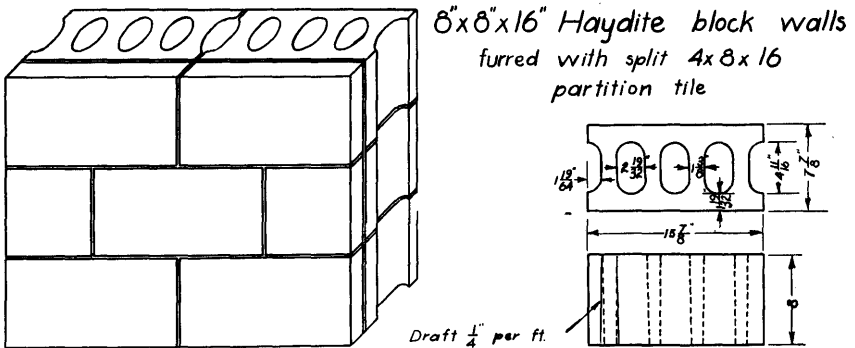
HAYDITE BLOCK WALL WITH FURRING UNIT
